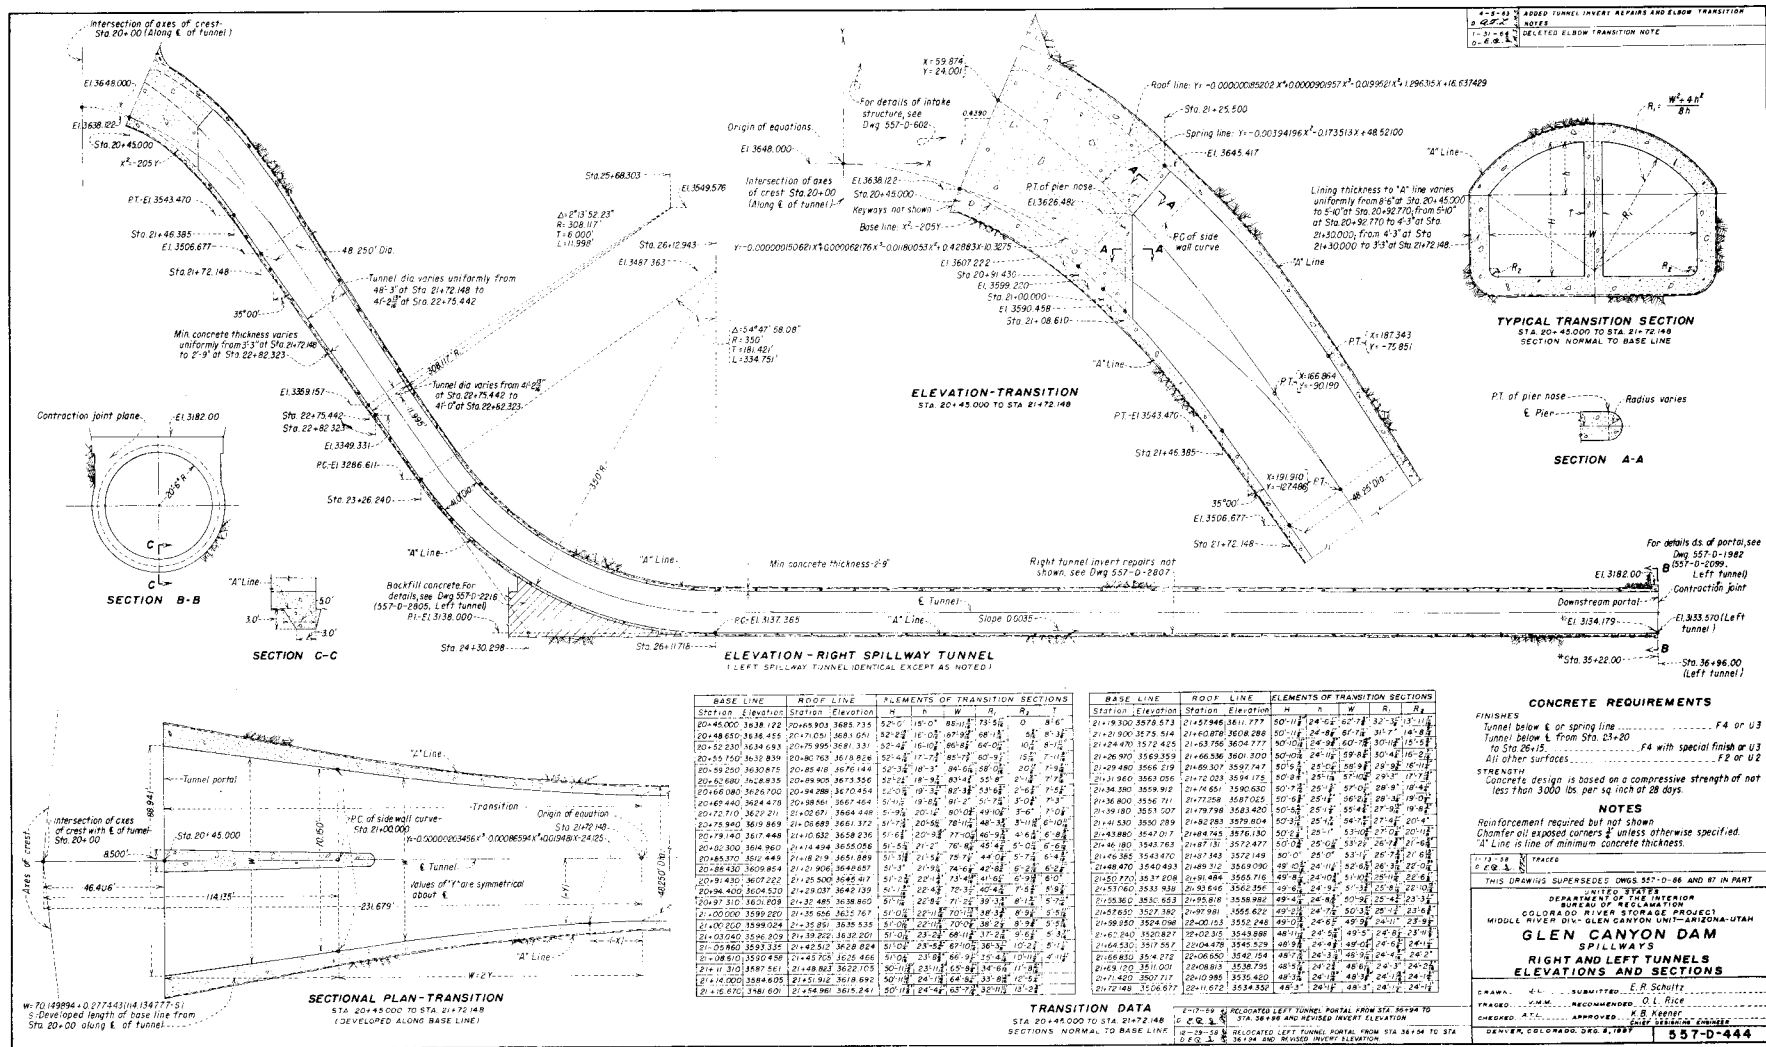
Spillways, right and left tunnels—Elevations and sections.
